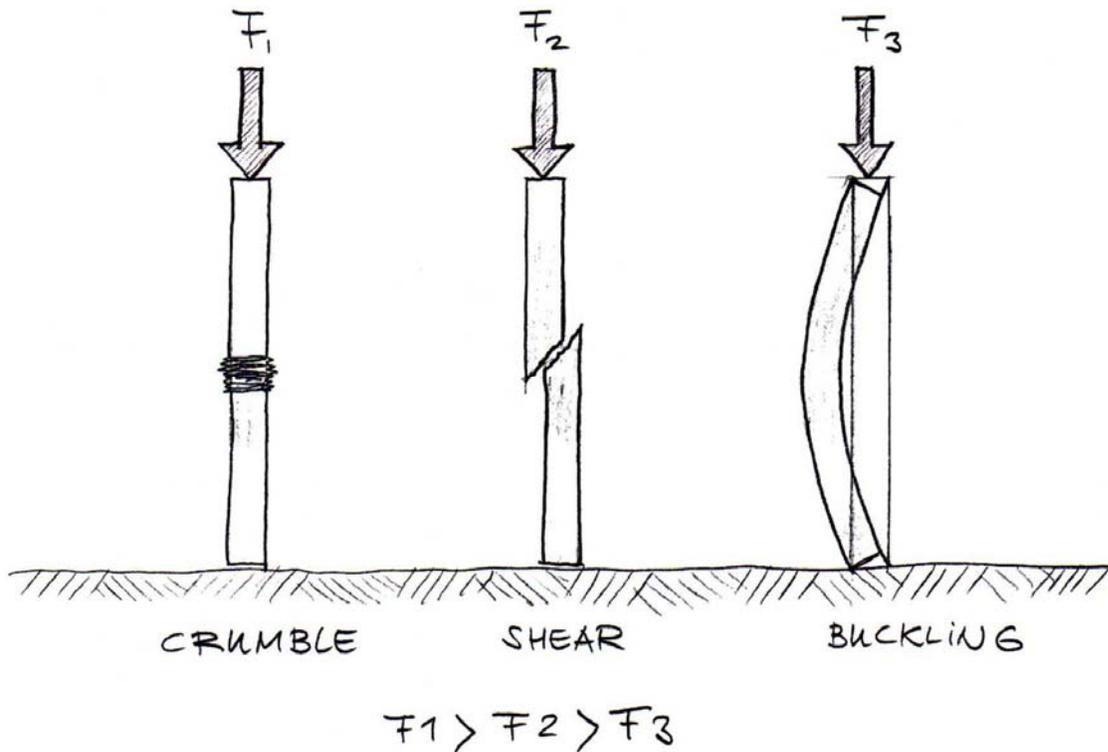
Failure Modes of Columns (Nijssse 60)
